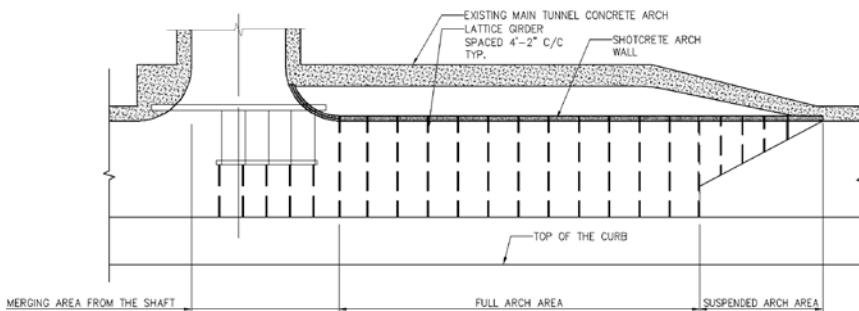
Tunnel ventilation arch wall section—longitudinal section
